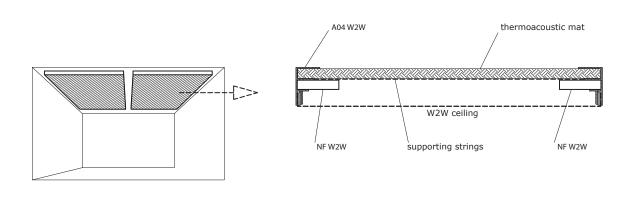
| CEILING PANELS WITH THERMAL BARRIER
